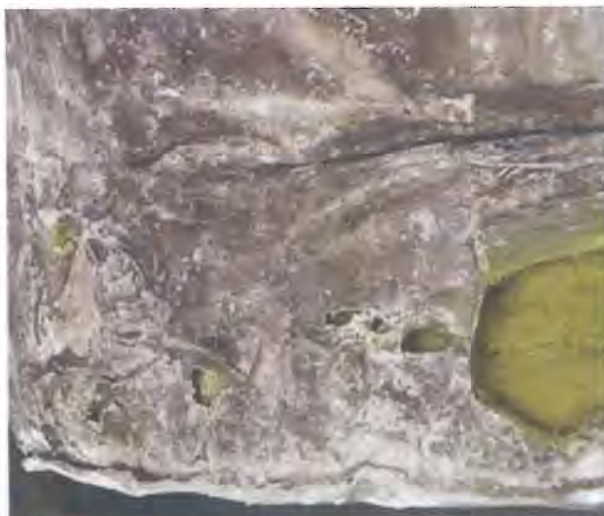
Primary vapour barrier aluminium foil with extensive localised corrosion and perforations.
